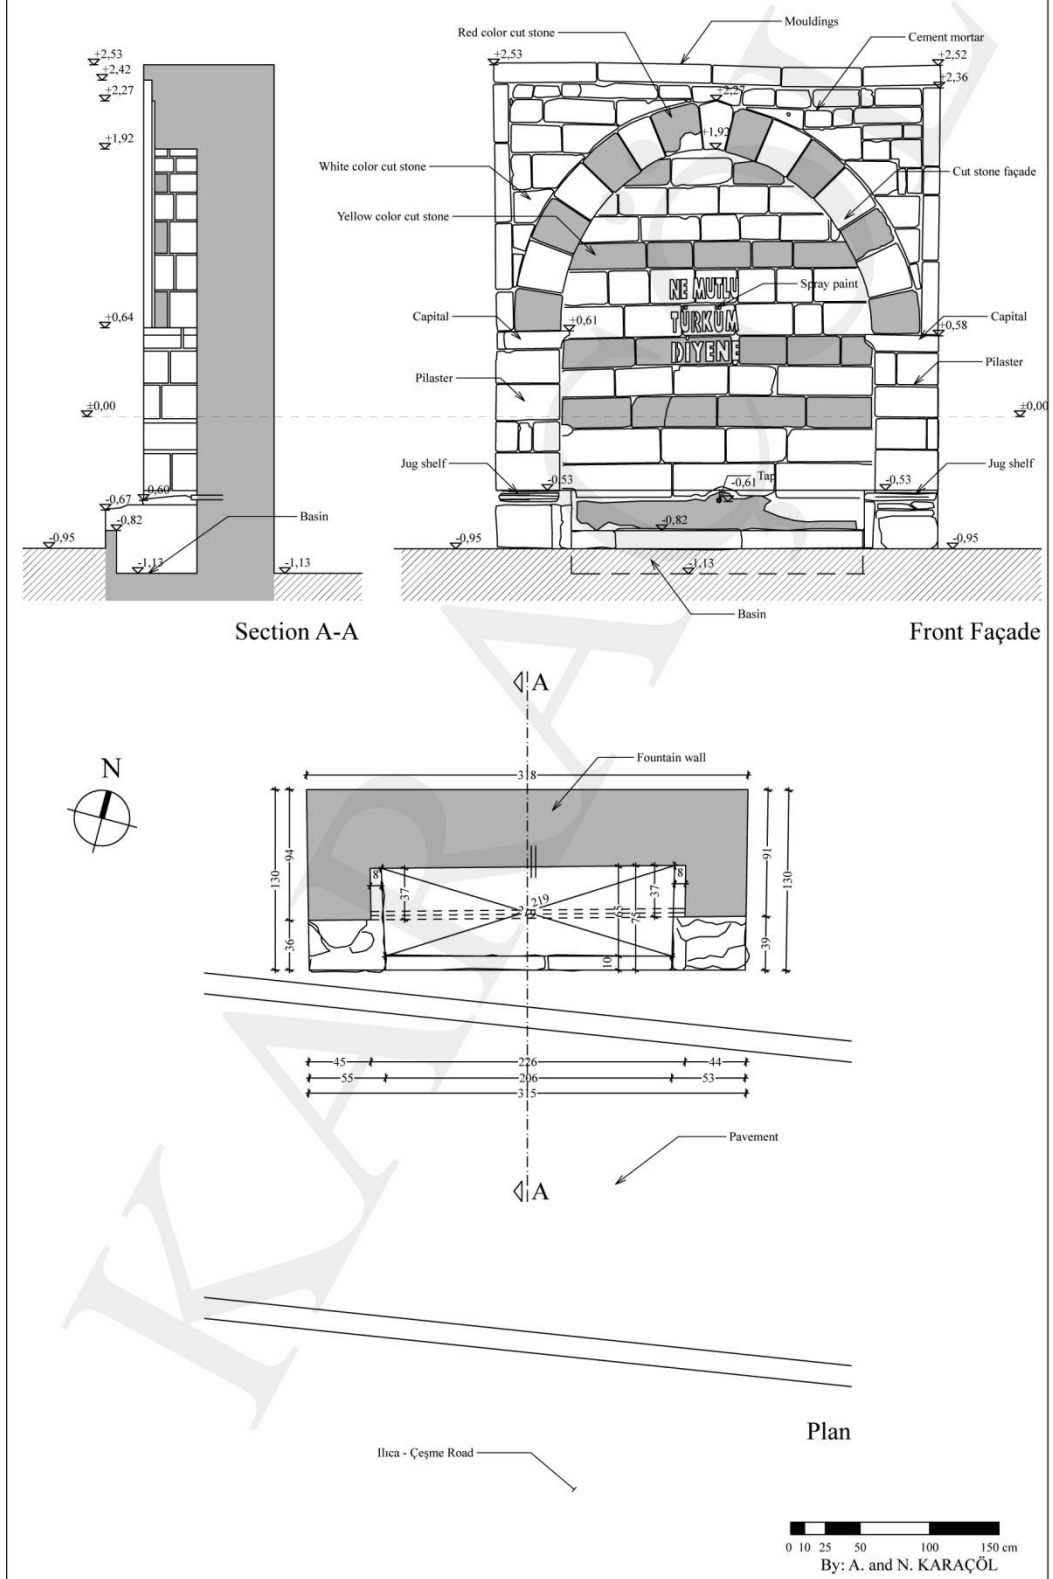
İlca Road Fountain section, front façade and plan drawings
